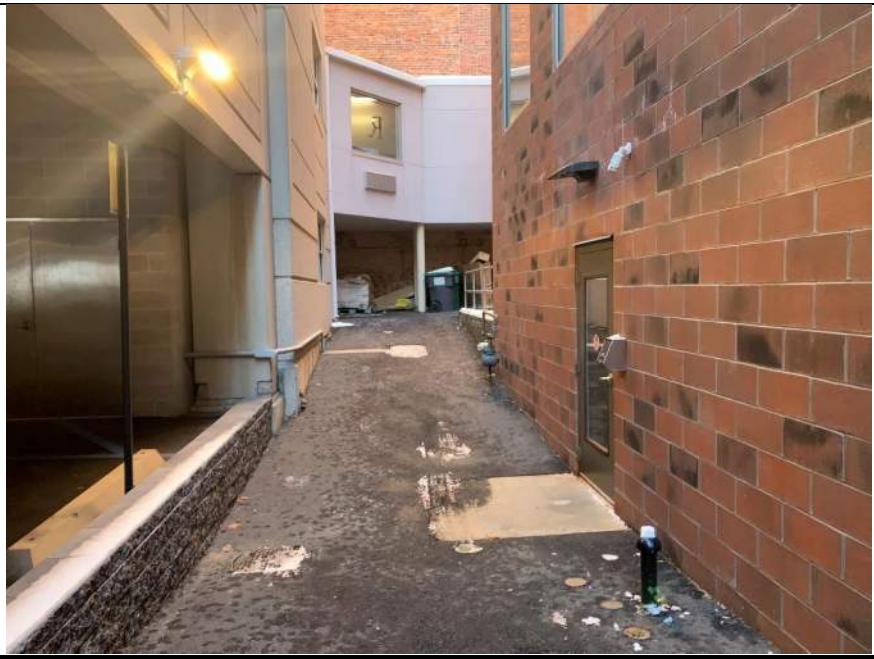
Looking northeast; paved surface cover in end alley (northeast end) between 144 State Street and parking garage (12/14/22).
